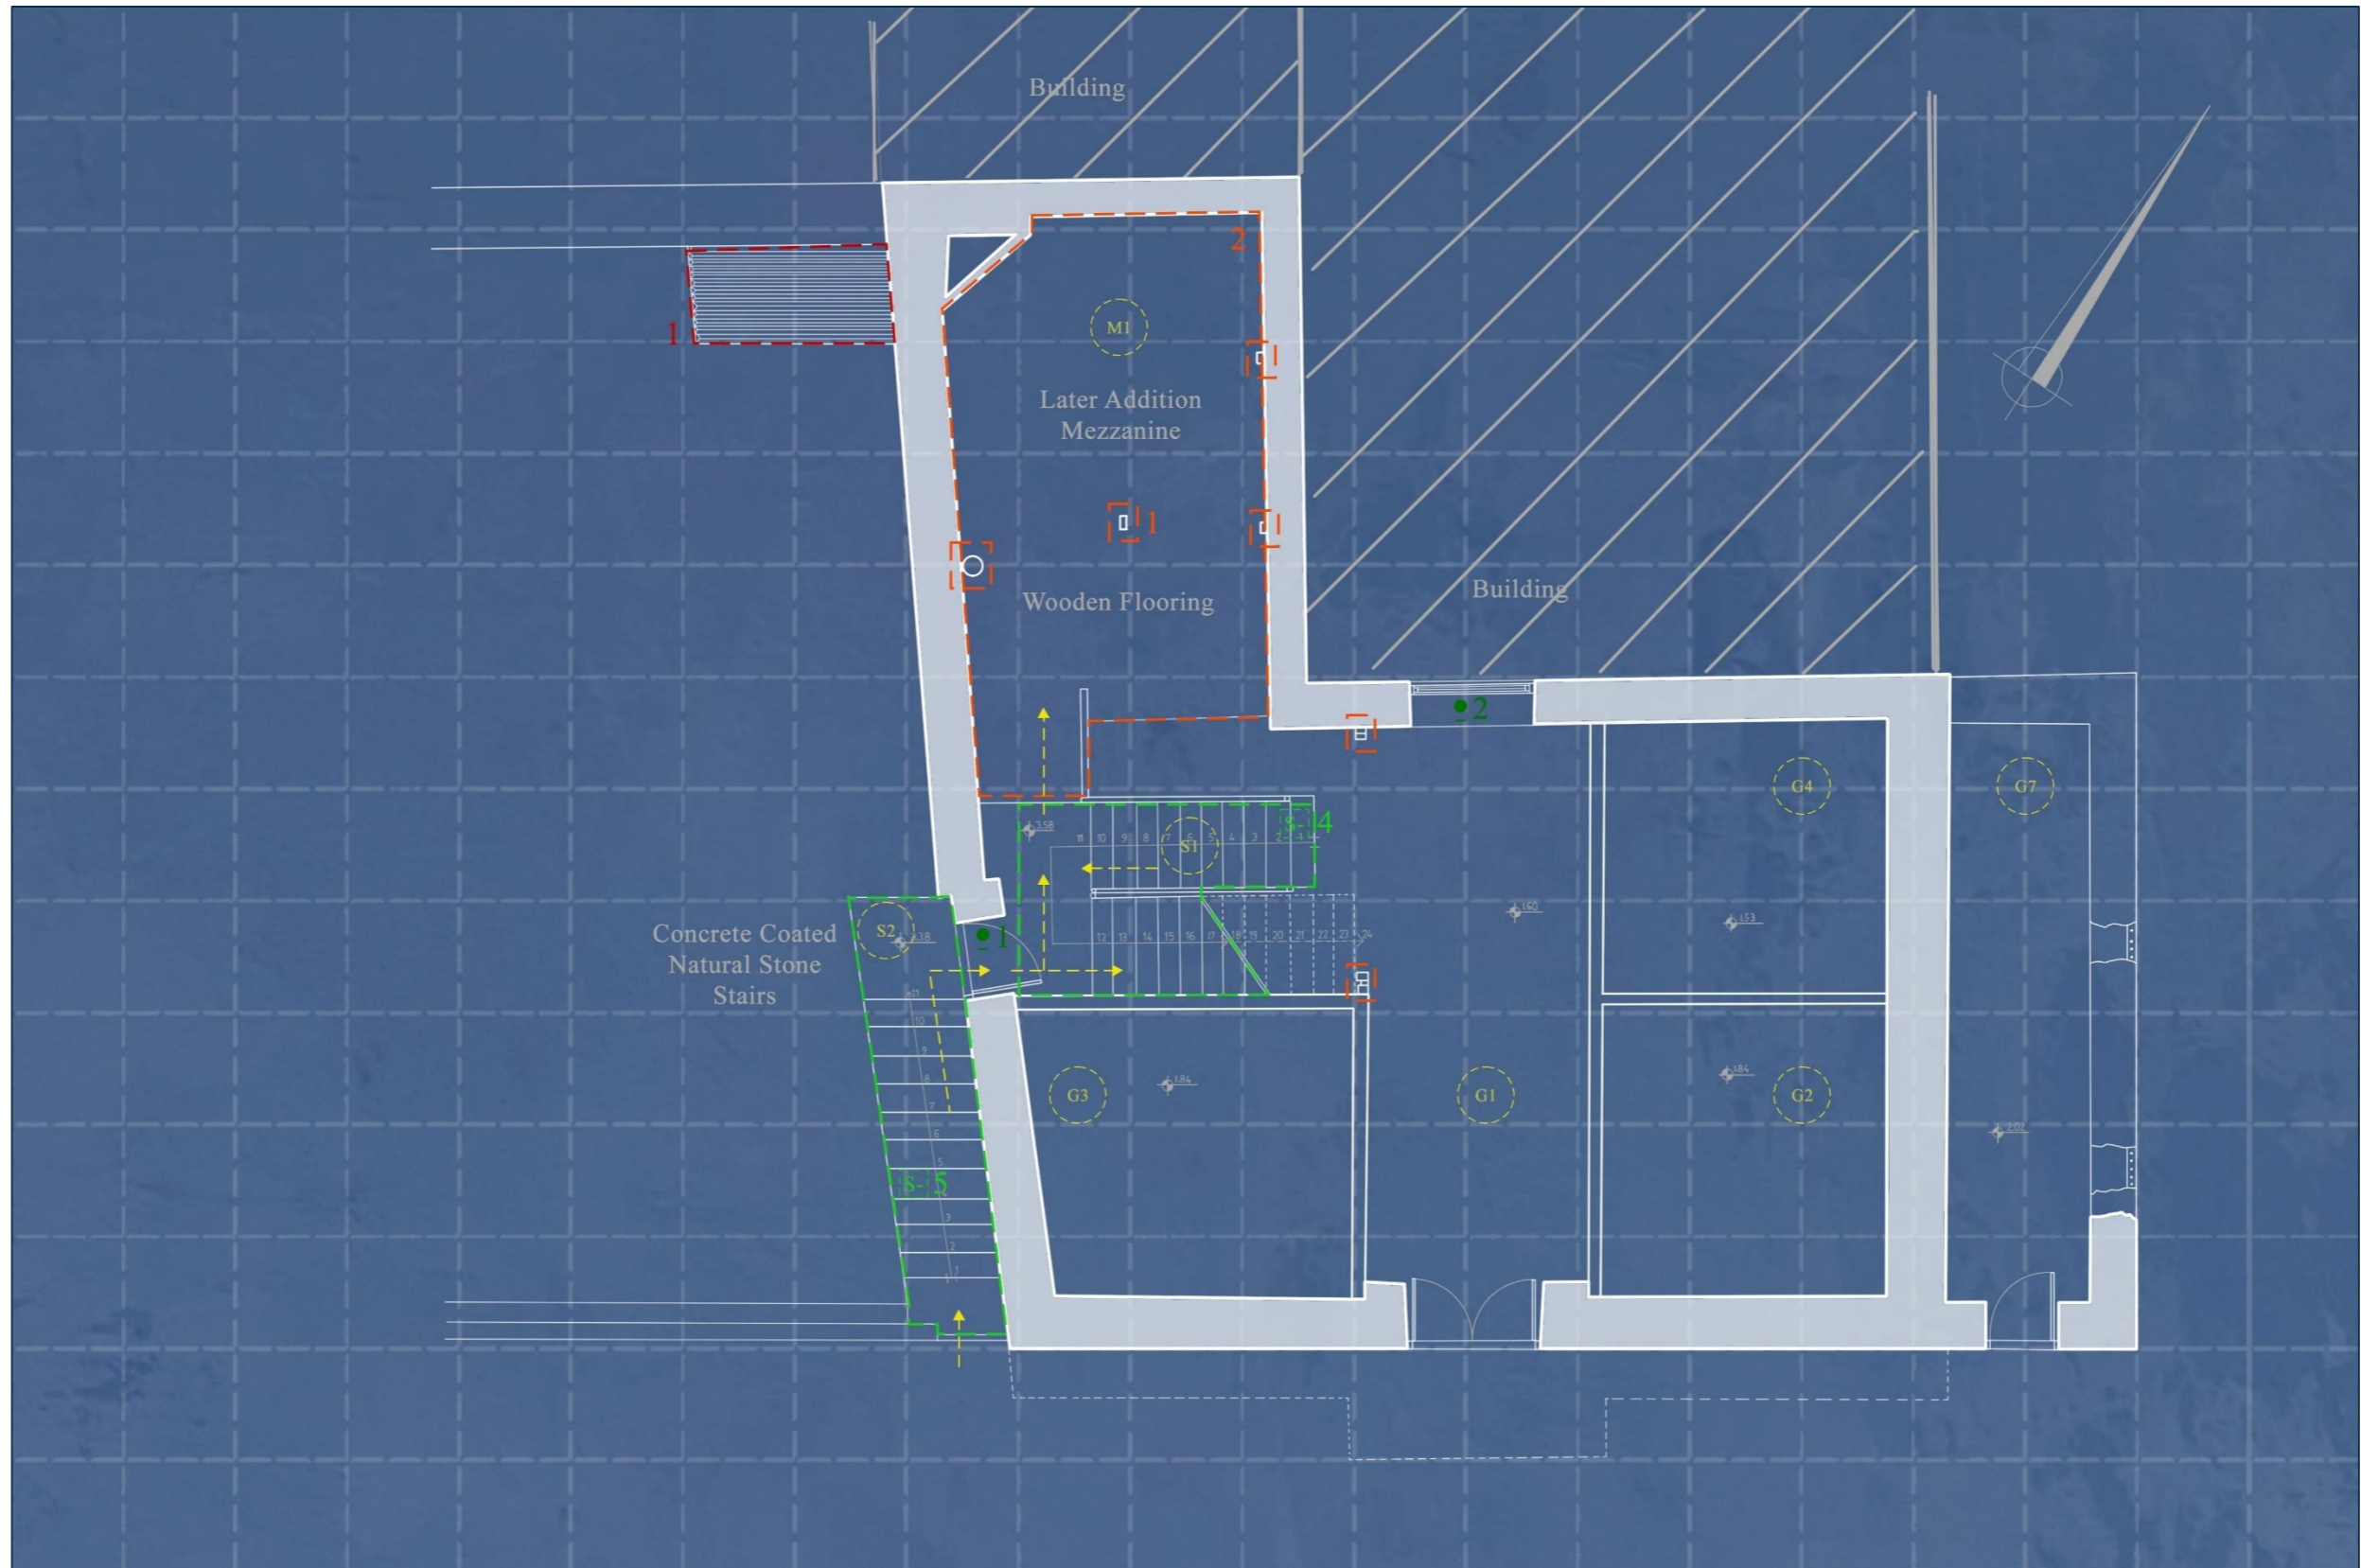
Original mezzanine intervention analysis plan of Building A. Prepared by the Author.
